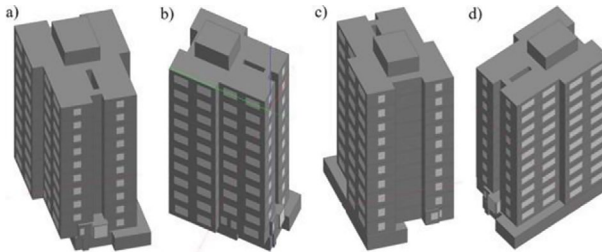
Base Building Model View: (a) South Facade, (b) West Facade, (c) North Facade, (d) East Facade.
